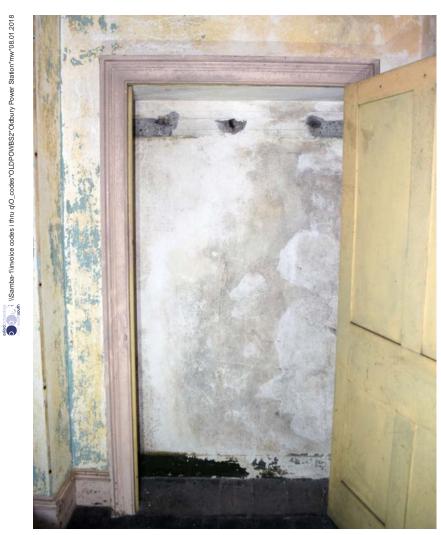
The wardrobe in the west wall of the south-west bedroom, looking west
